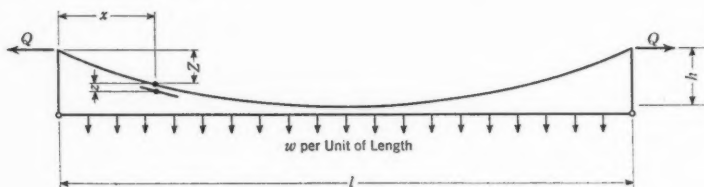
MAIN SPAN OF SUSPENSION BRIDGE
